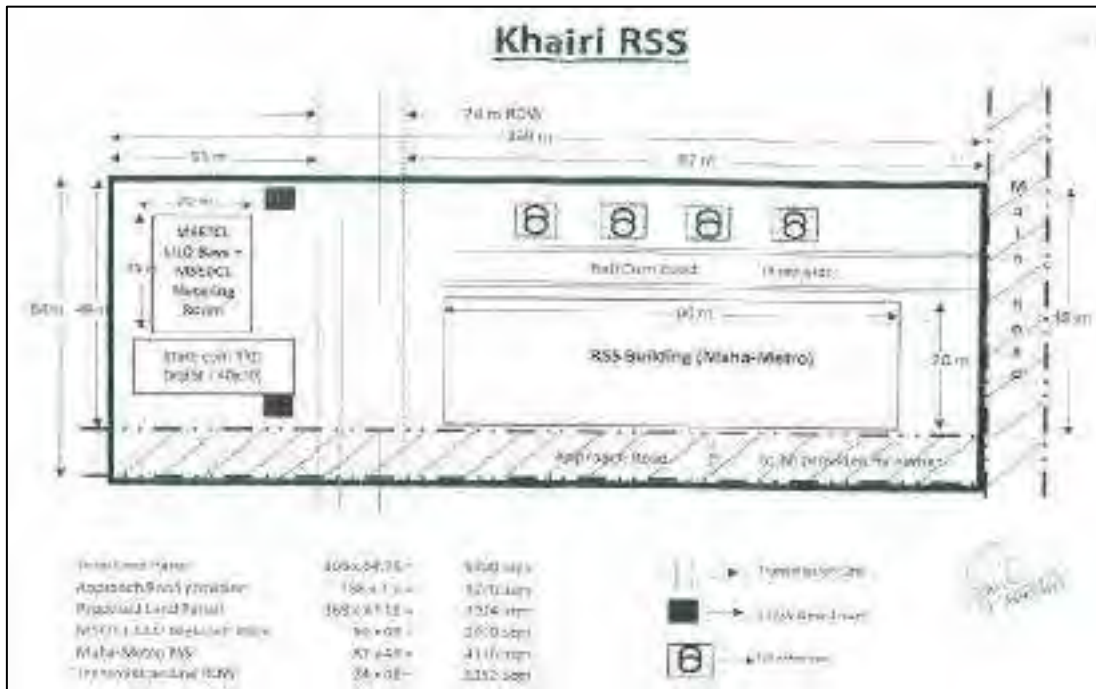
LAYOUT PLAN OF KHAIRI RSS
